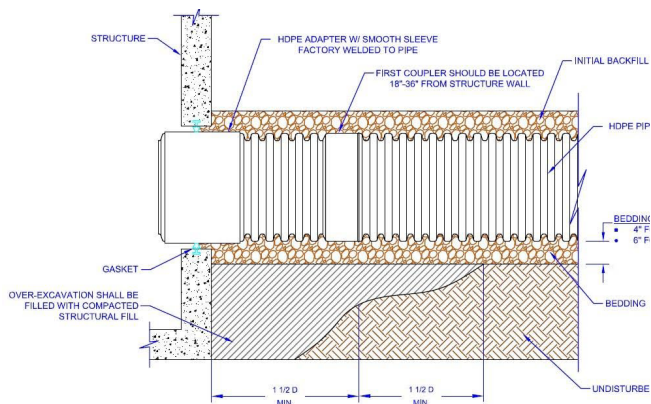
TYPICAL STRUCTURE CONNECTION
